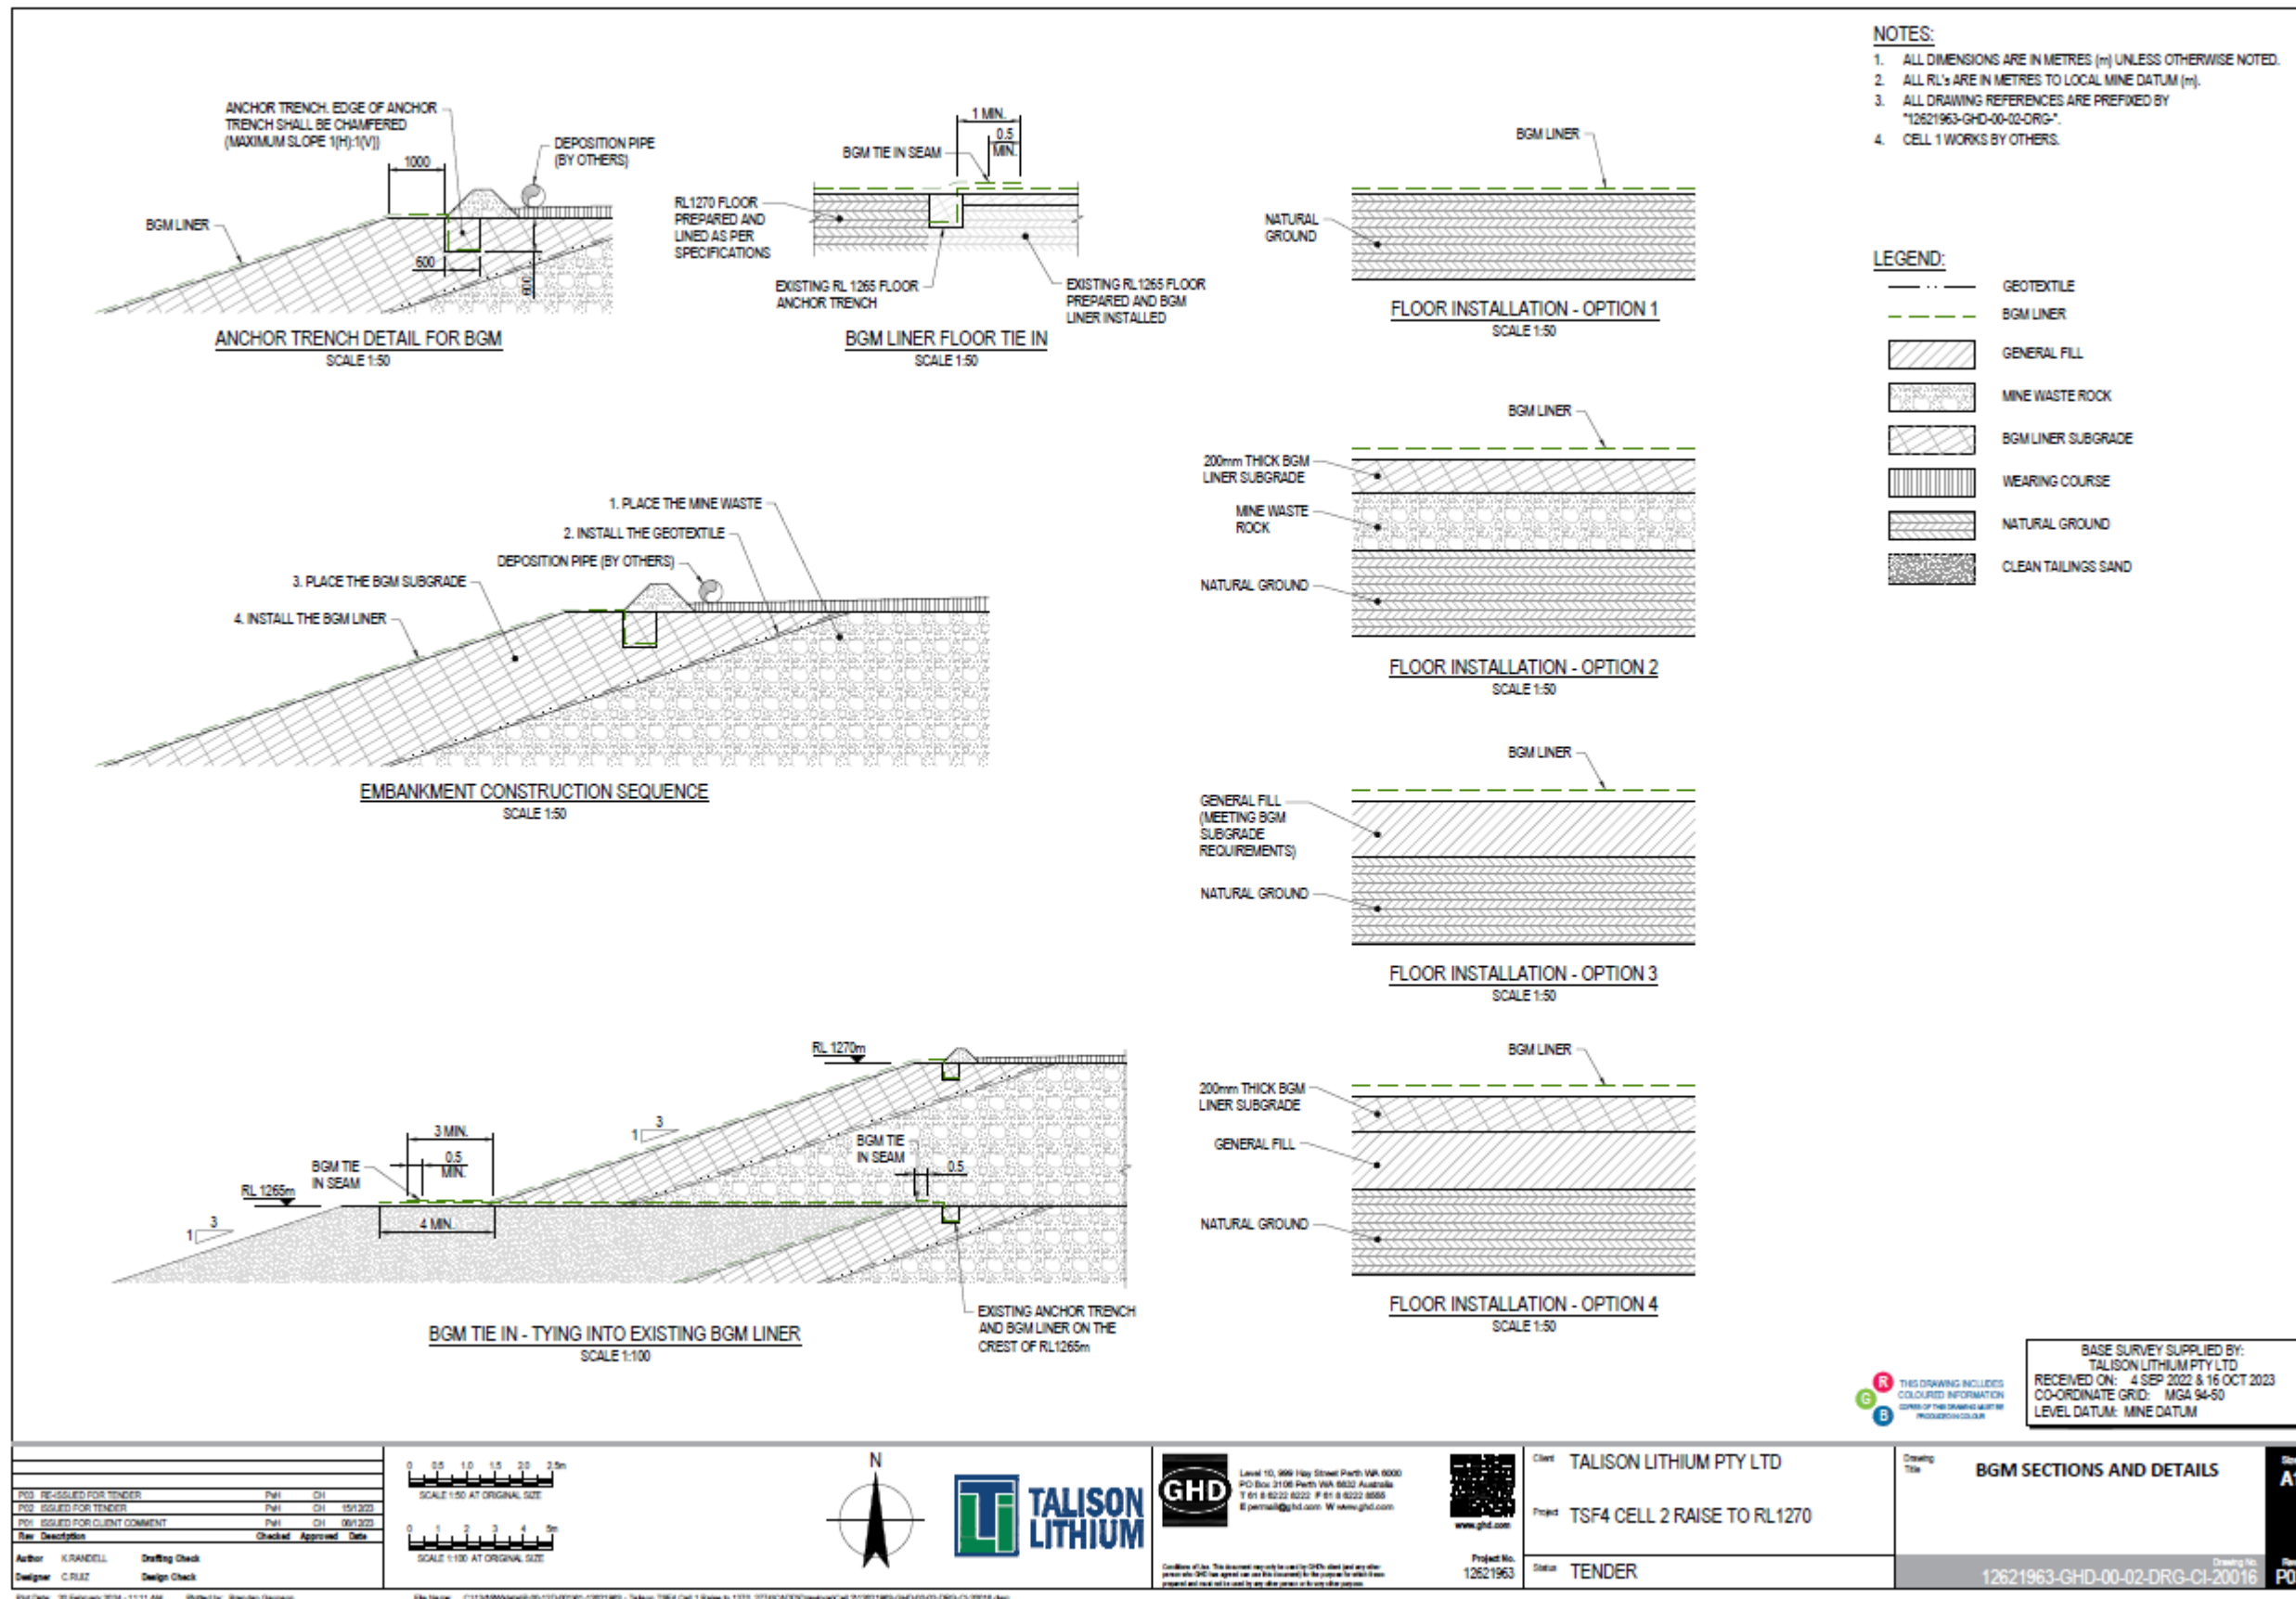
TSF4 embankment raise to 270 m AHD / 1270 m RL – BGM sections and details
